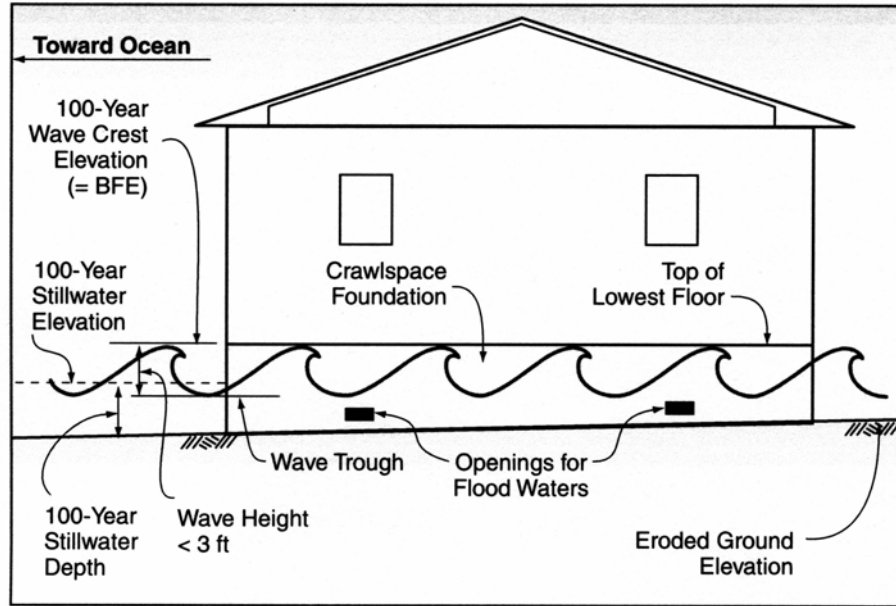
Minimum NFIP A-zone standards require that the lowest floor be at or above the Base Flood Elevation (BFE). Foundation walls below the BFE must be equipped with openings to allow equal interior and exterior hydrostatic pressures. Reprinted with permission from the FEMA Coastal Construction Manual (FEMA, 2000).
